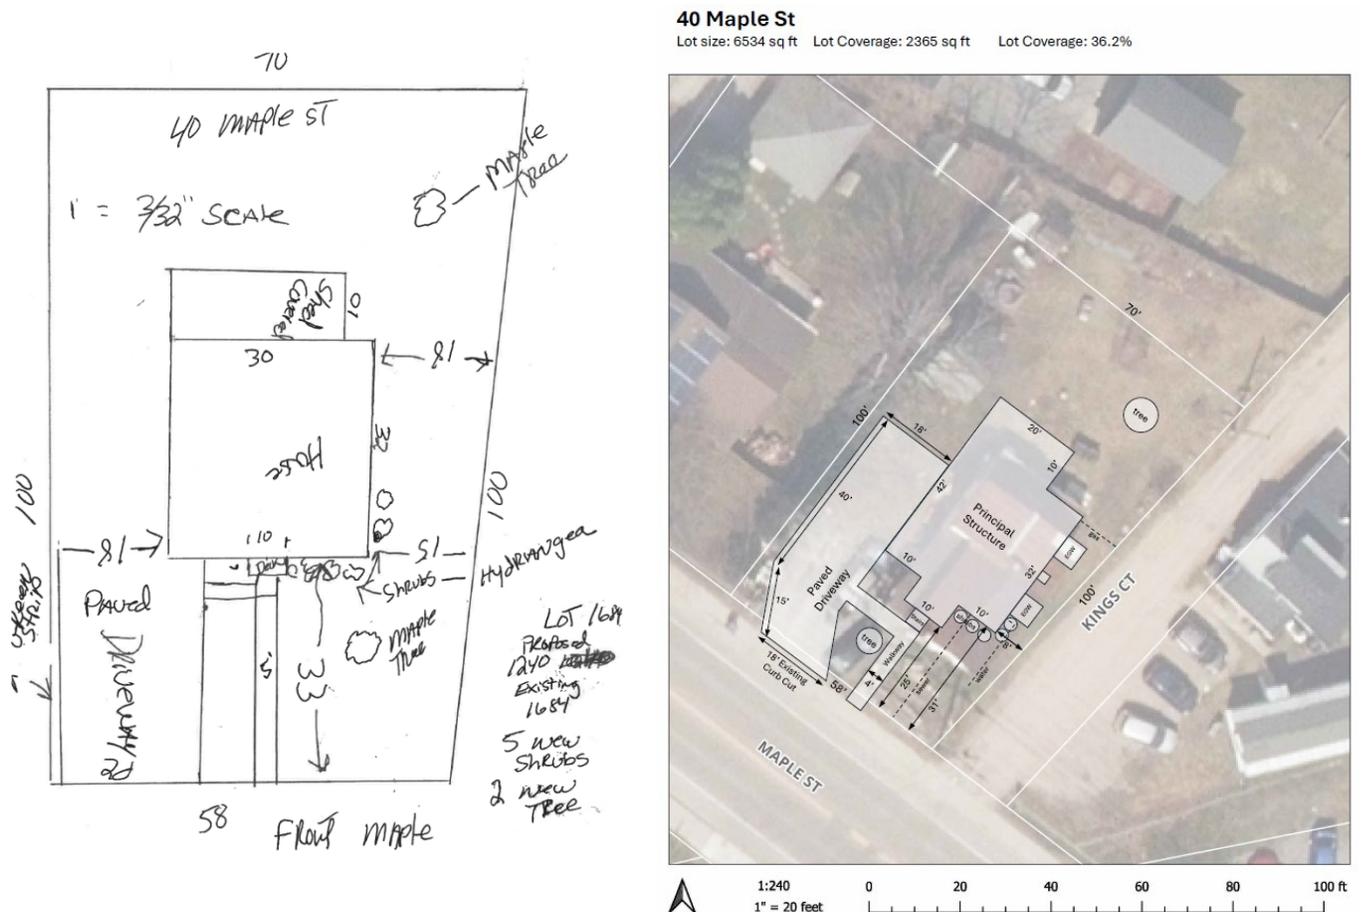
Top-down site plan. Left: Submitted site plan; Right: Amended Site Plan based on as-built measurements. Note: Driveway, walkway, and landscaping have not been completed.
